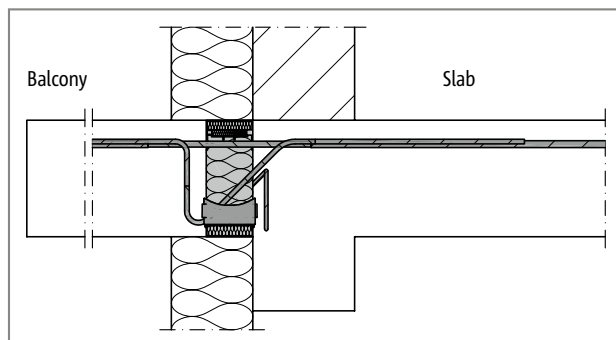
Schöck Isokorb® T type K-E, K-T: Connection for edge beam and thermal insulation composite system (WDVS)
